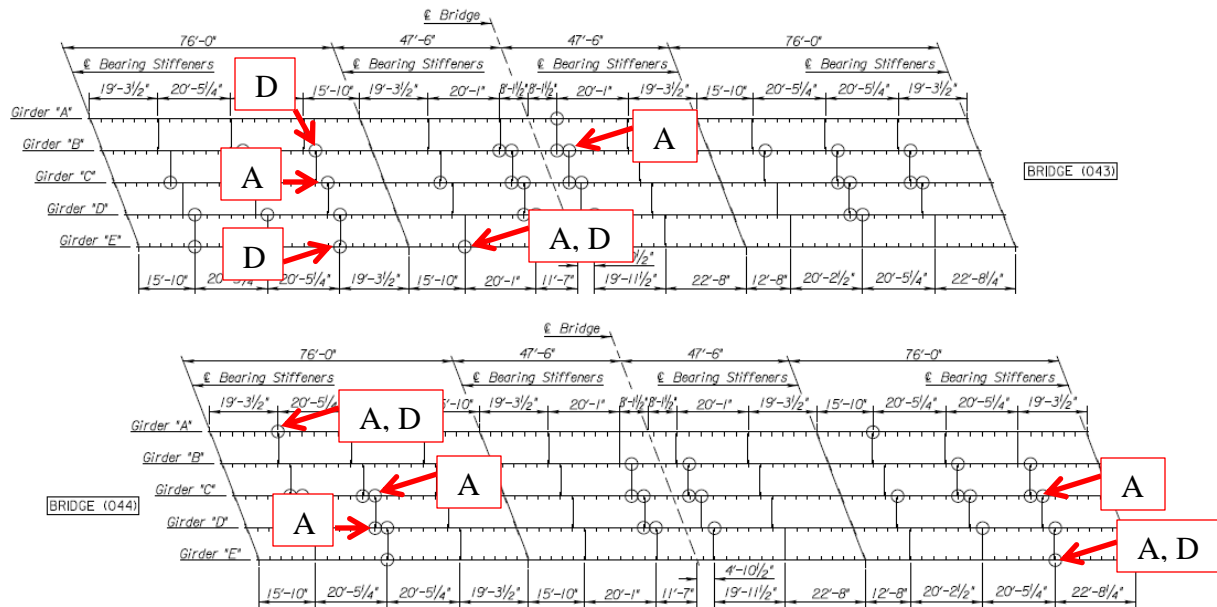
Top web gap crack locations in Kansas Bridge 135-87(043/044) with crack types indicated.
